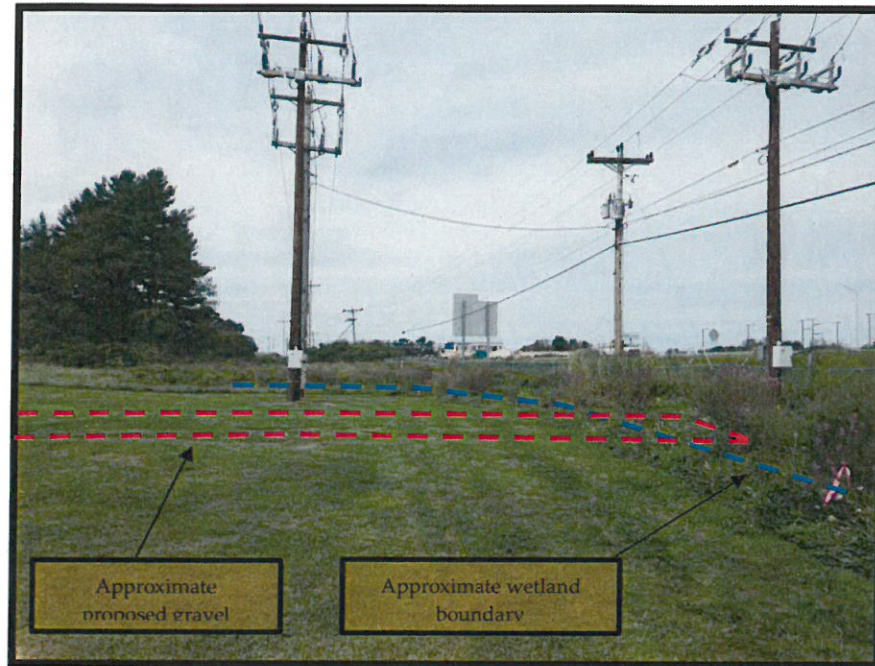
Northwest side of wetland PW1, facing east toward Route 16/Route 4 (Spaulding Turnpike).
